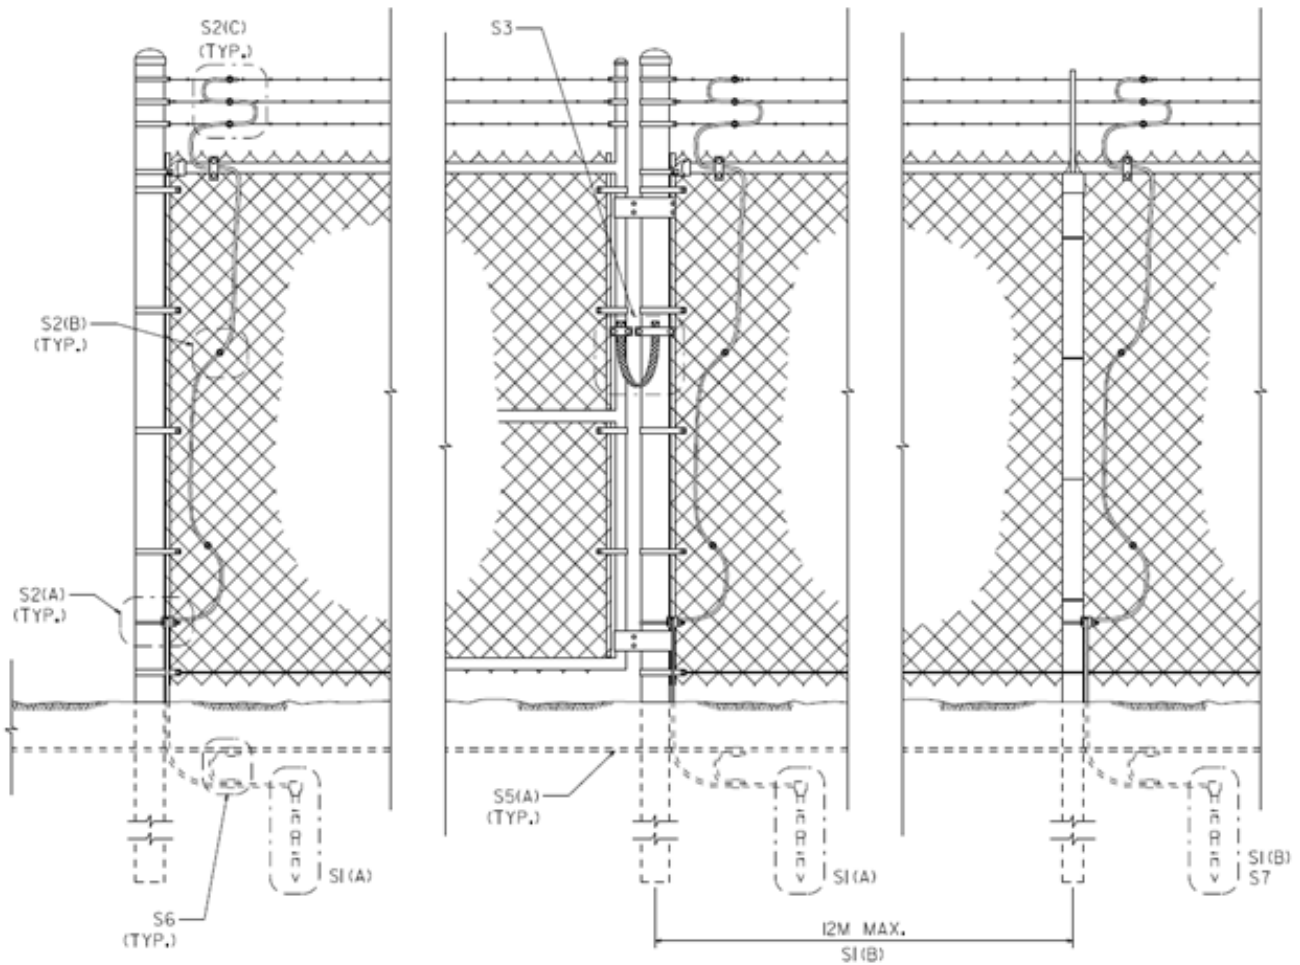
~ Typical Grounding Plan View – Fence Grounding Interconnection
